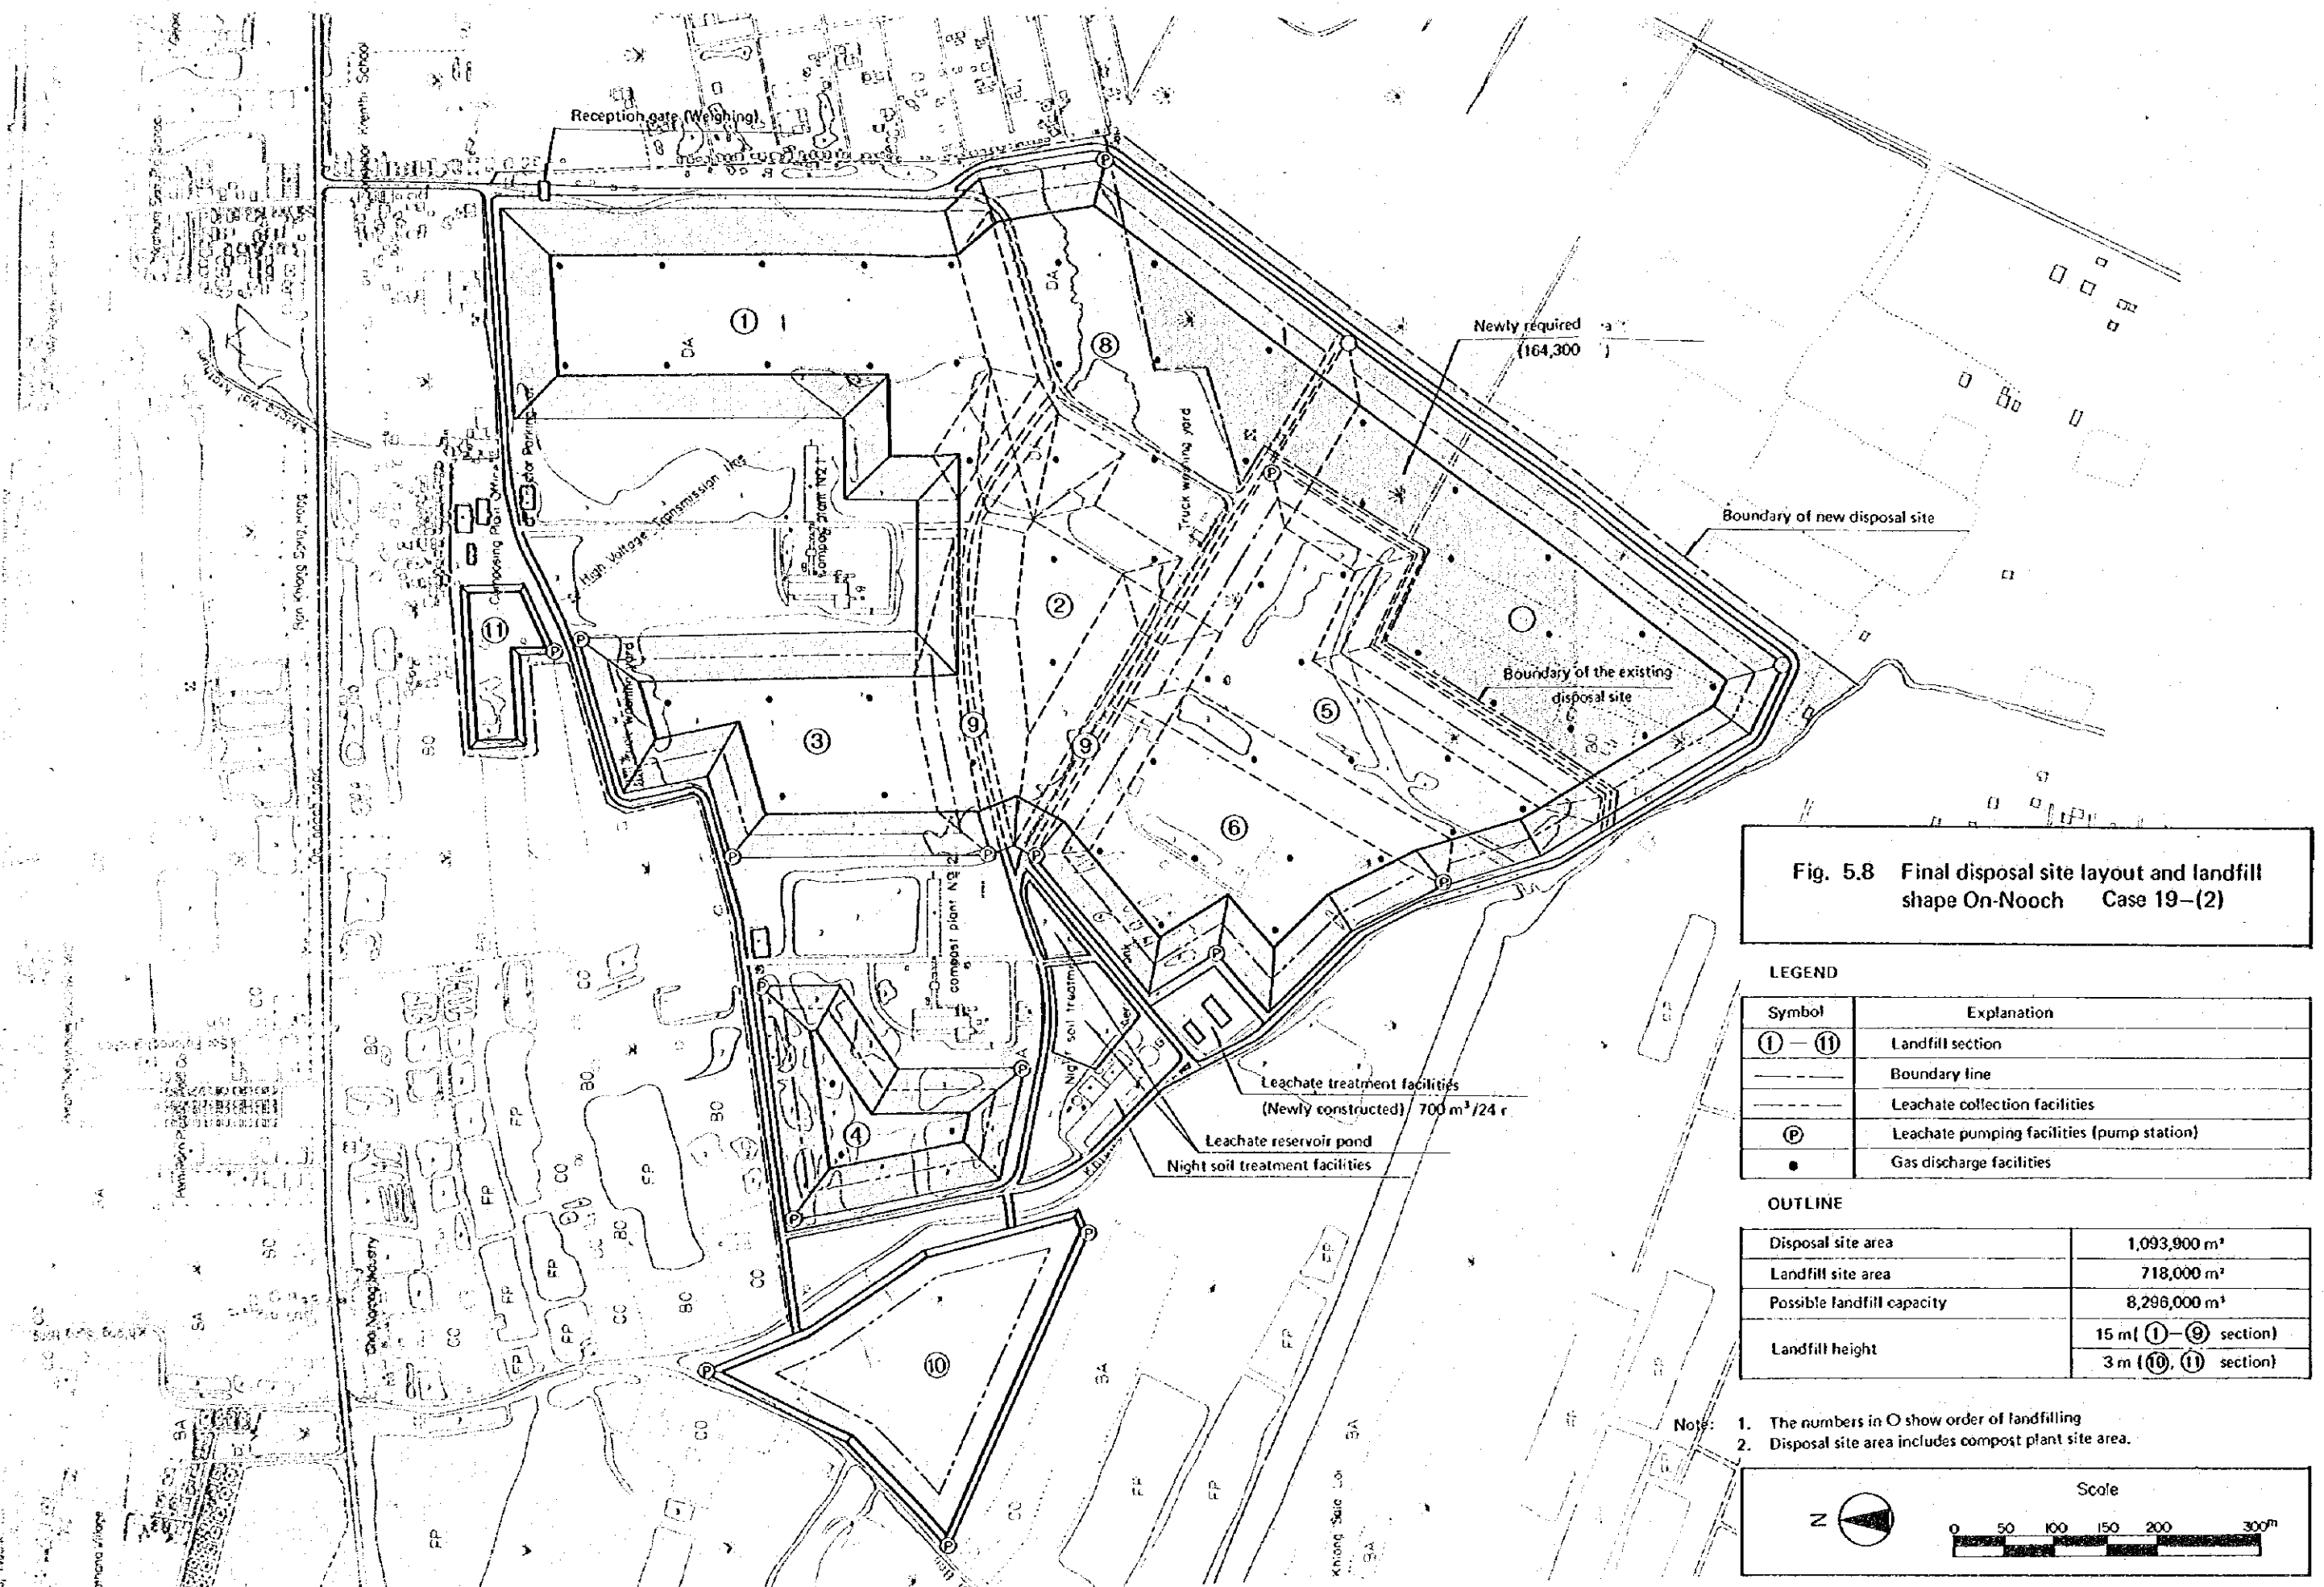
Final disposal site layout and landfill shape On-Nooch Case 19-(2)
